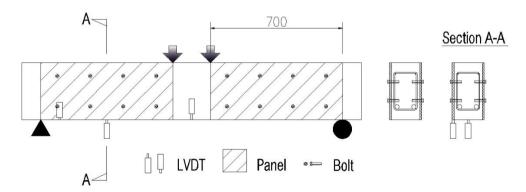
Details of strengthened specimens and measurement (unit: mm)
